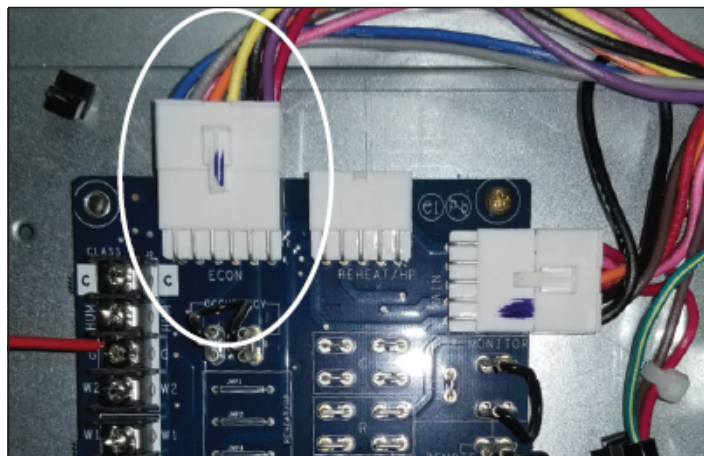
Plug 12 Pin ECON plug into removed Unit Control Board (UCB) 12 Pin Plug and Connect 12-Pin Controller Plug to Unit Control Board
